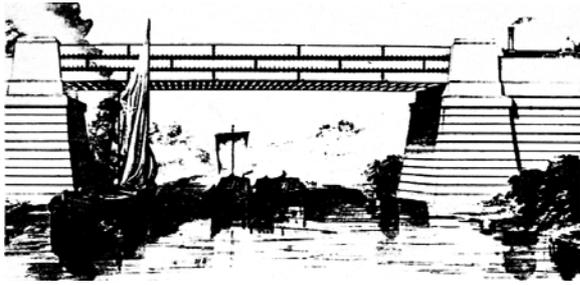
Built-up cast-iron girder of 36.6 m (120 ft) span, Robert Stephenson, 1845. (Sutherland²)
